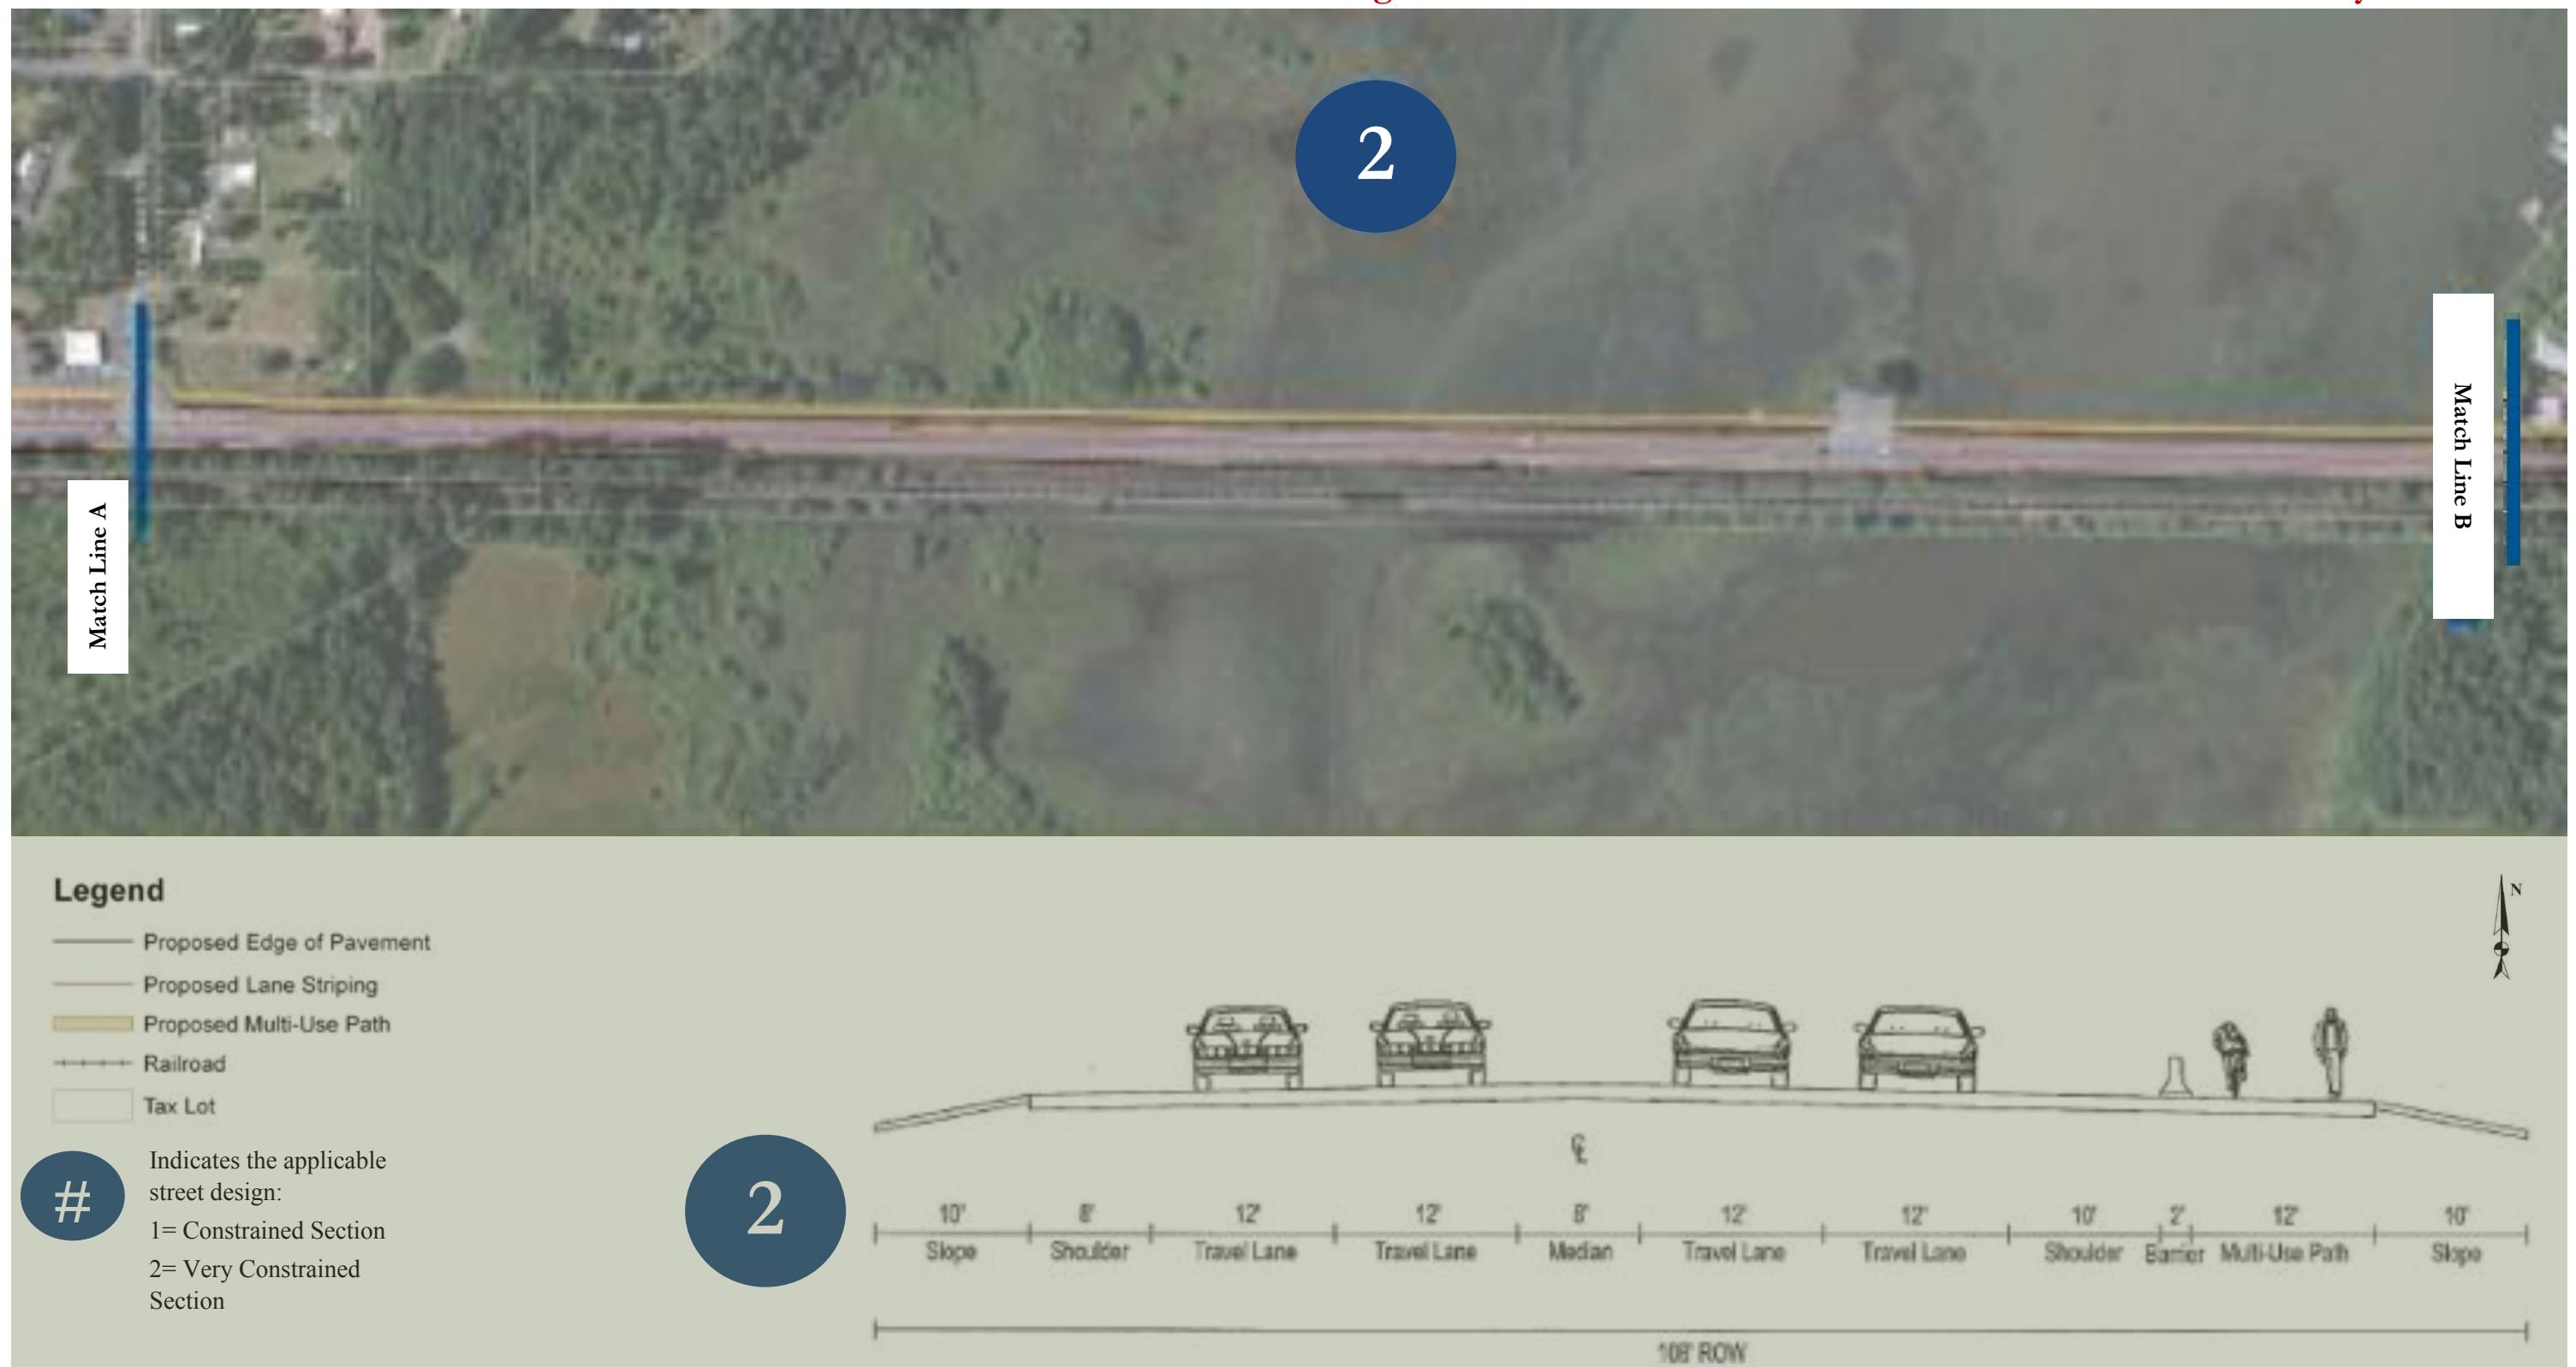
Recommended Corridor Plan: Shady Rest Drive to Central Road
